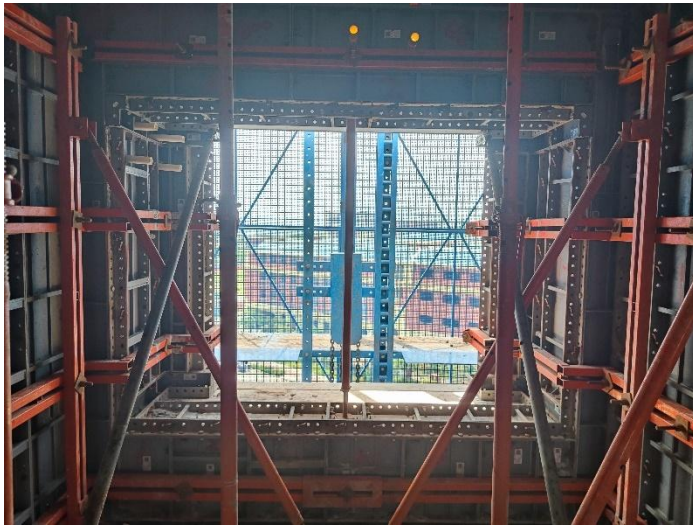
Integrated construction of PC+aluminium moulding+climbing frame
